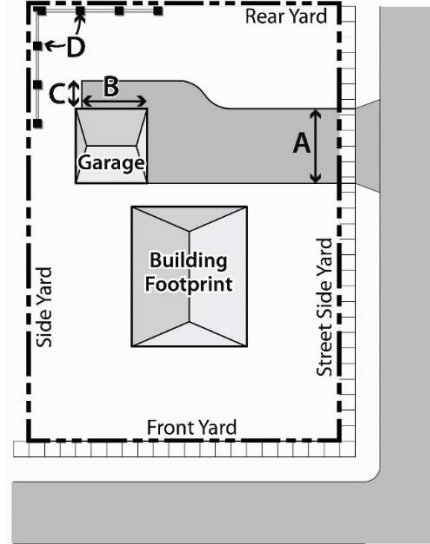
Parking Beside Detached Garage – Corner Lots
